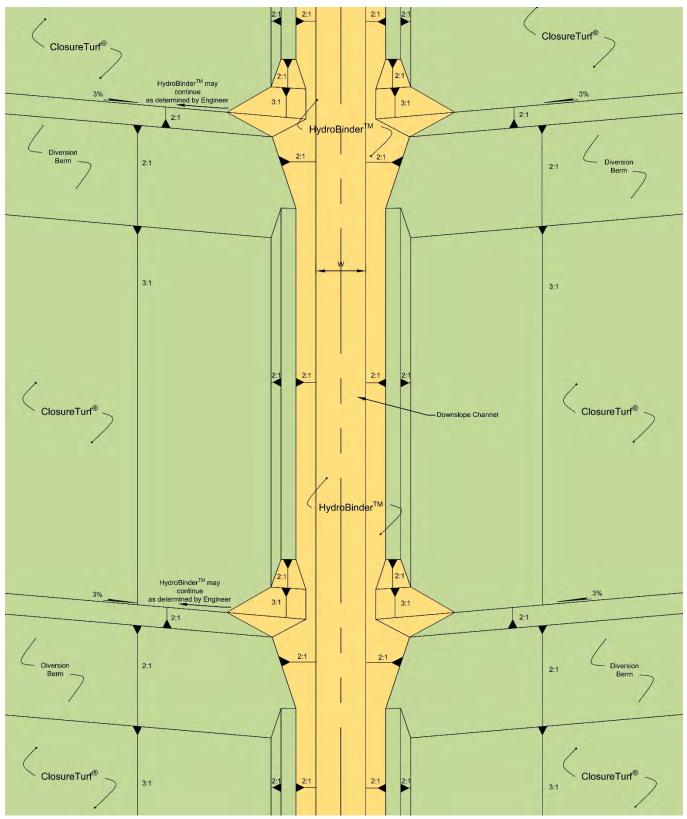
Typical HydroBinder[®] Infill Placement in Downslope Channels
